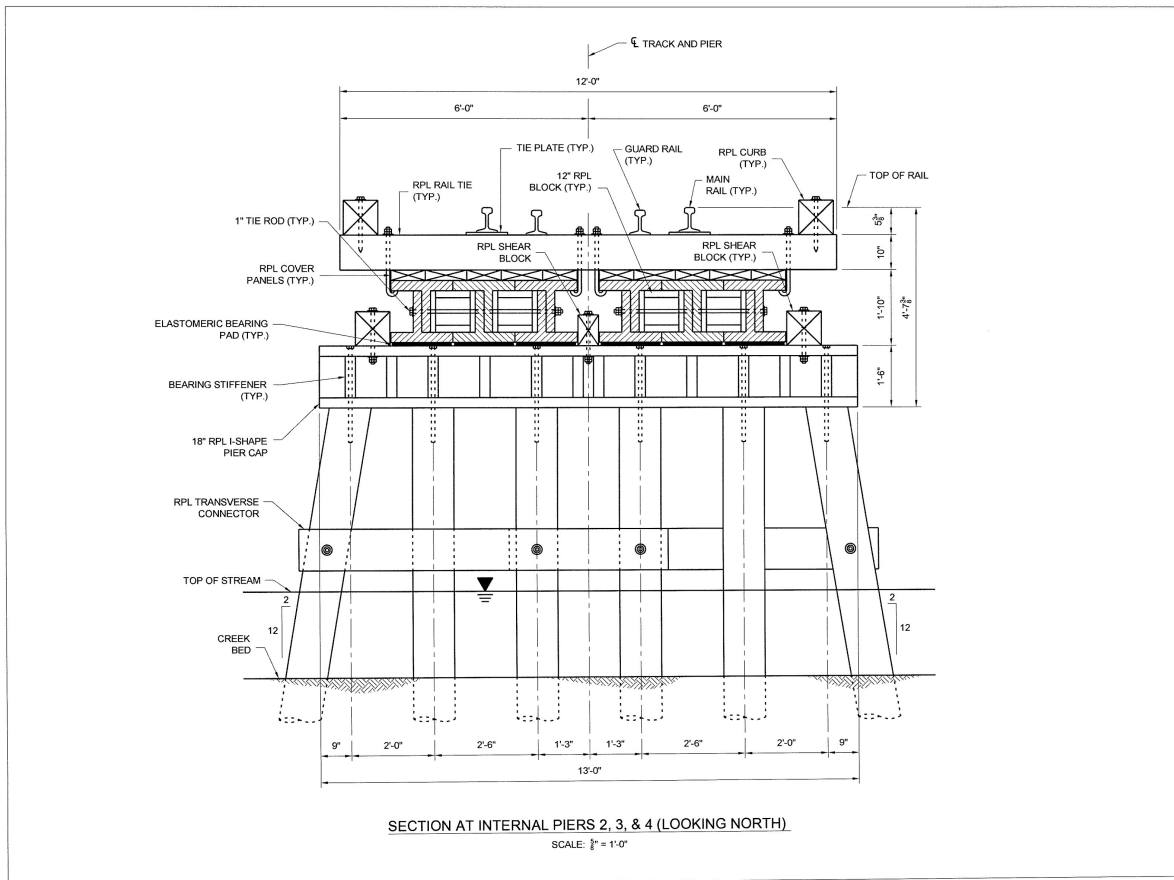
Typical cross section of bridge at Fort Eustis, Virginia
